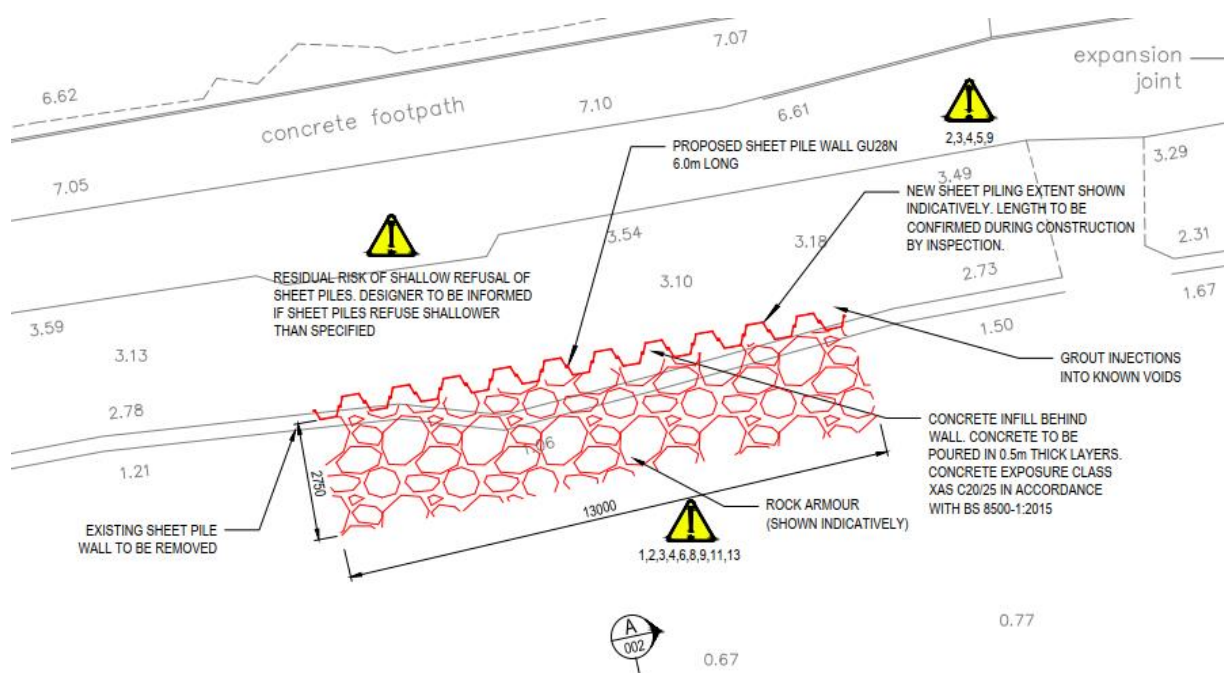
General Arrangement drawing section - image capture taken from 'GA ON PROPOSED SHEET PILE WALL AND ROCK ARMOUR' created by Crouch Waterfall, Project Number: 23162B / Drawing Number: 001 - Revision B03, dated June 2023, provided by Daniel Overson (MPH Construction) on 23rd February 2024.
